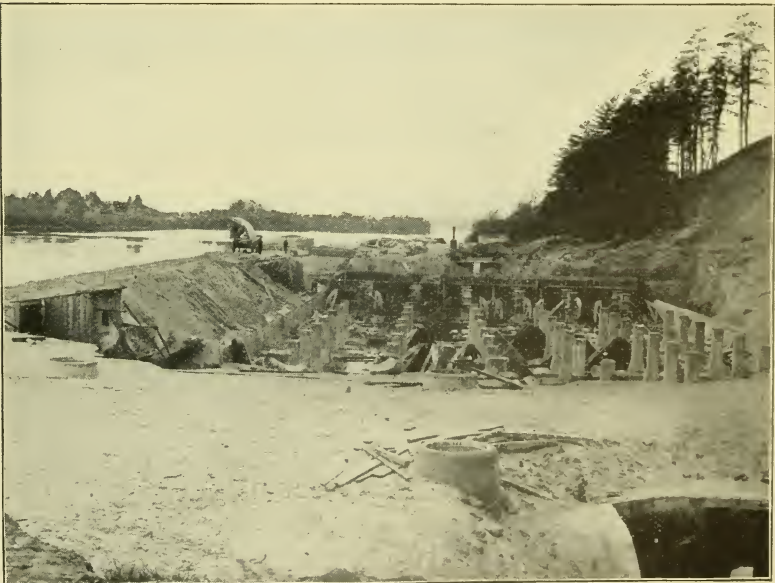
Piers and Forms for Vaulting, looking West, May 24, 1907.
